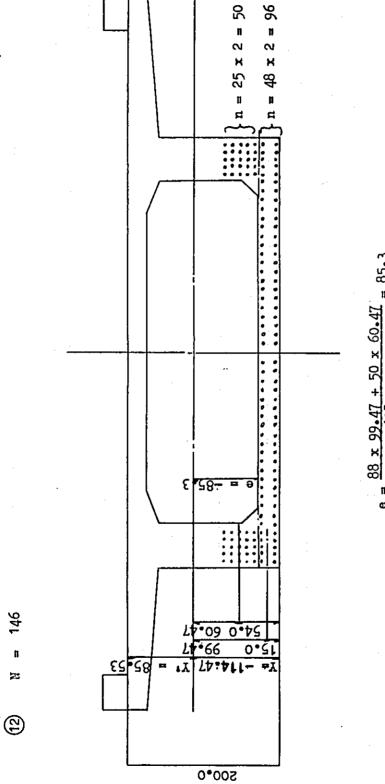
LOCATION OF PRESTRESSED BARS
